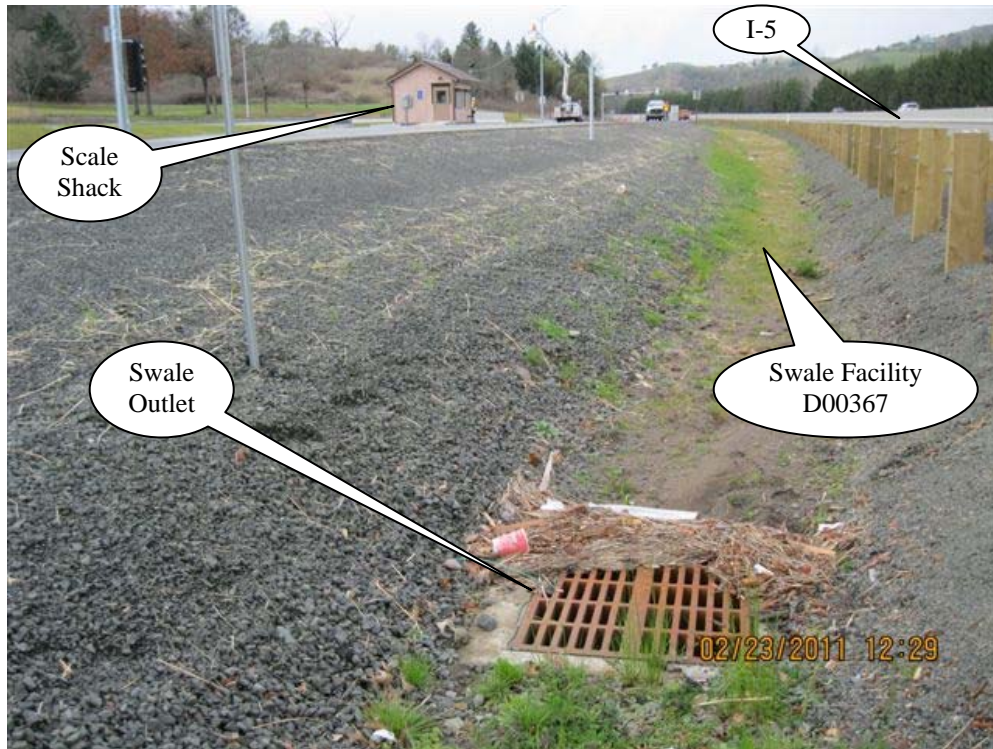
Photo looking north at swale with outlet shown at the bottom of picture.
